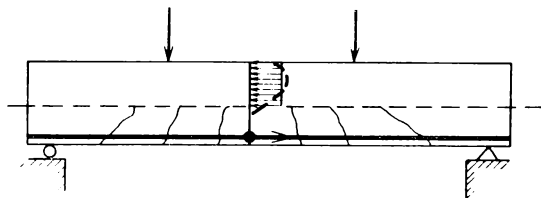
State of stress in the compression zone of a bending reinforced concrete beam
